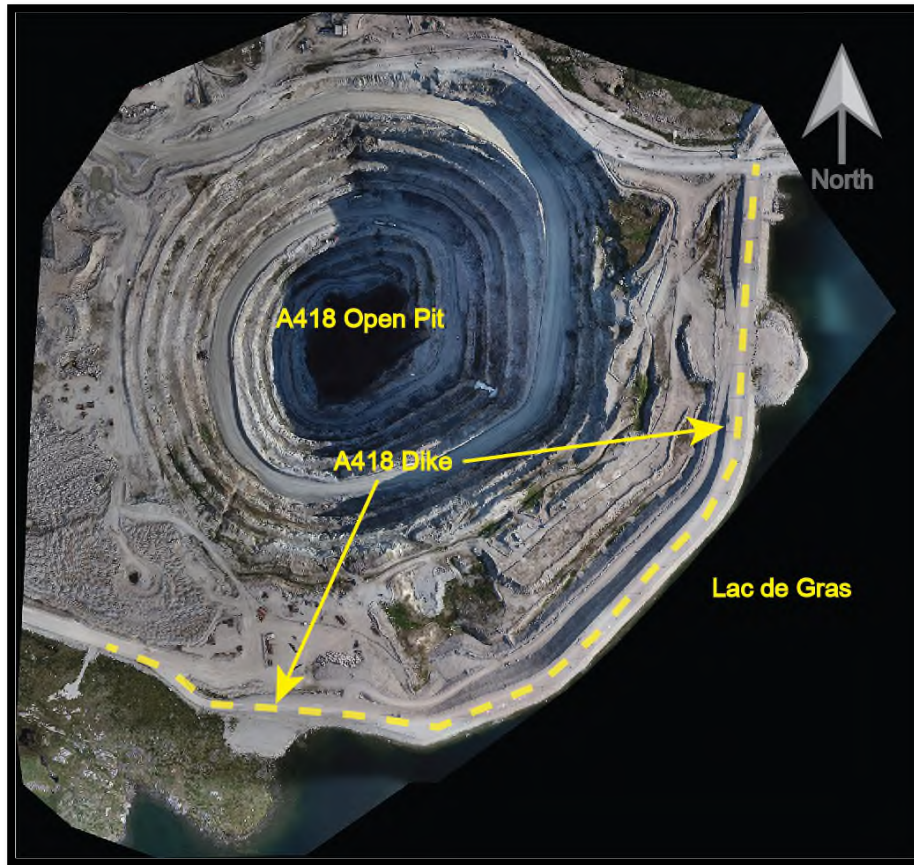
A418 Dike Site Plan (DDMI 2022a)
